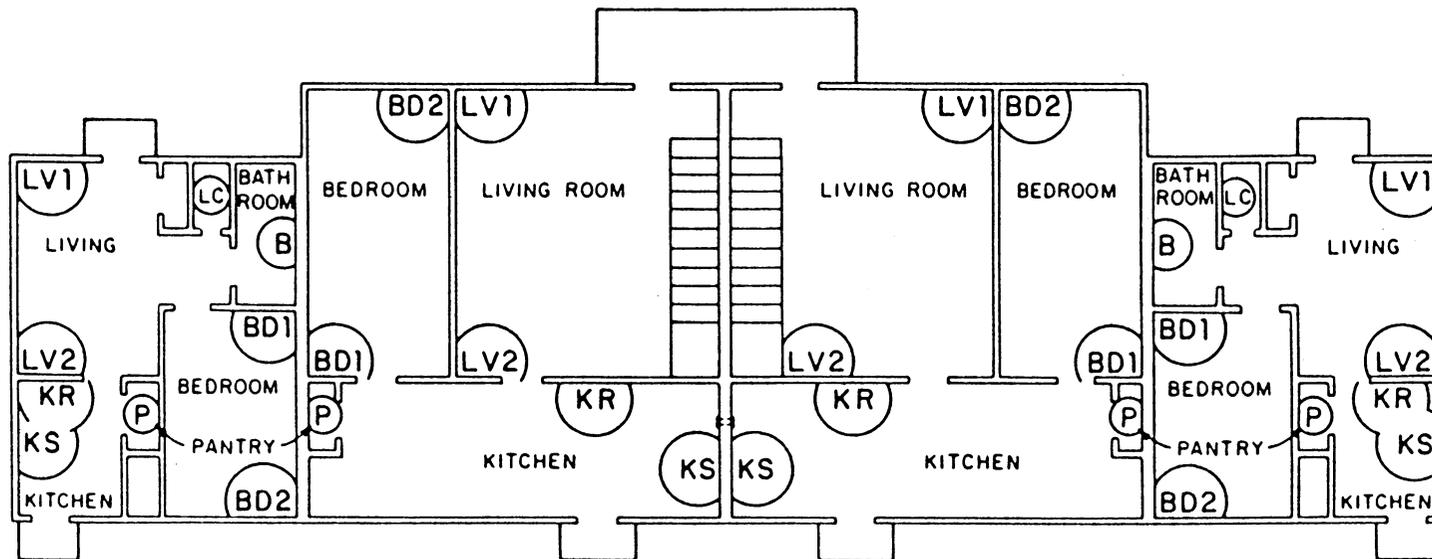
Diagram of the first floor of Building Two showing trap locations and plumbing between apartments.
